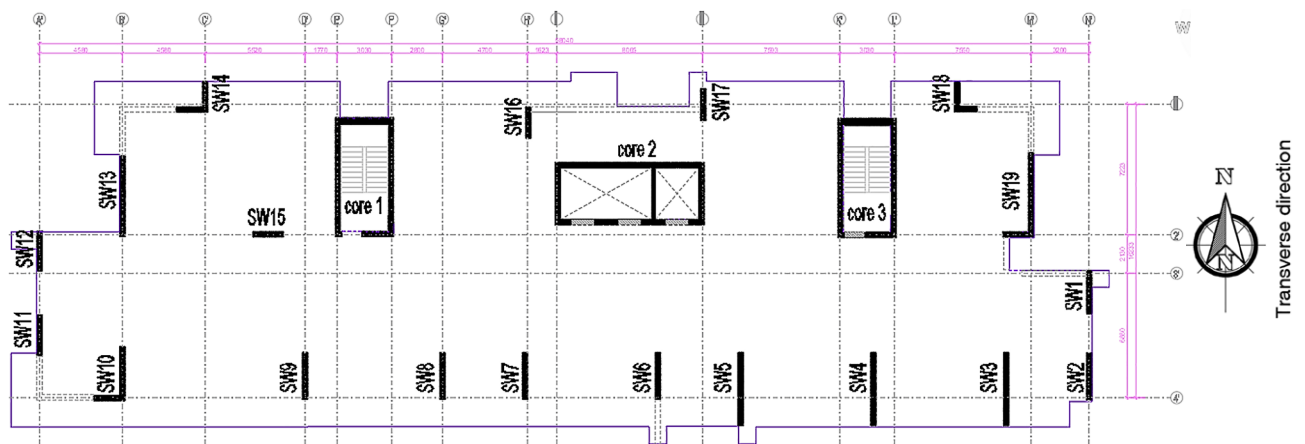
Plan view of the labeled-shear-wall layout for typical floors
